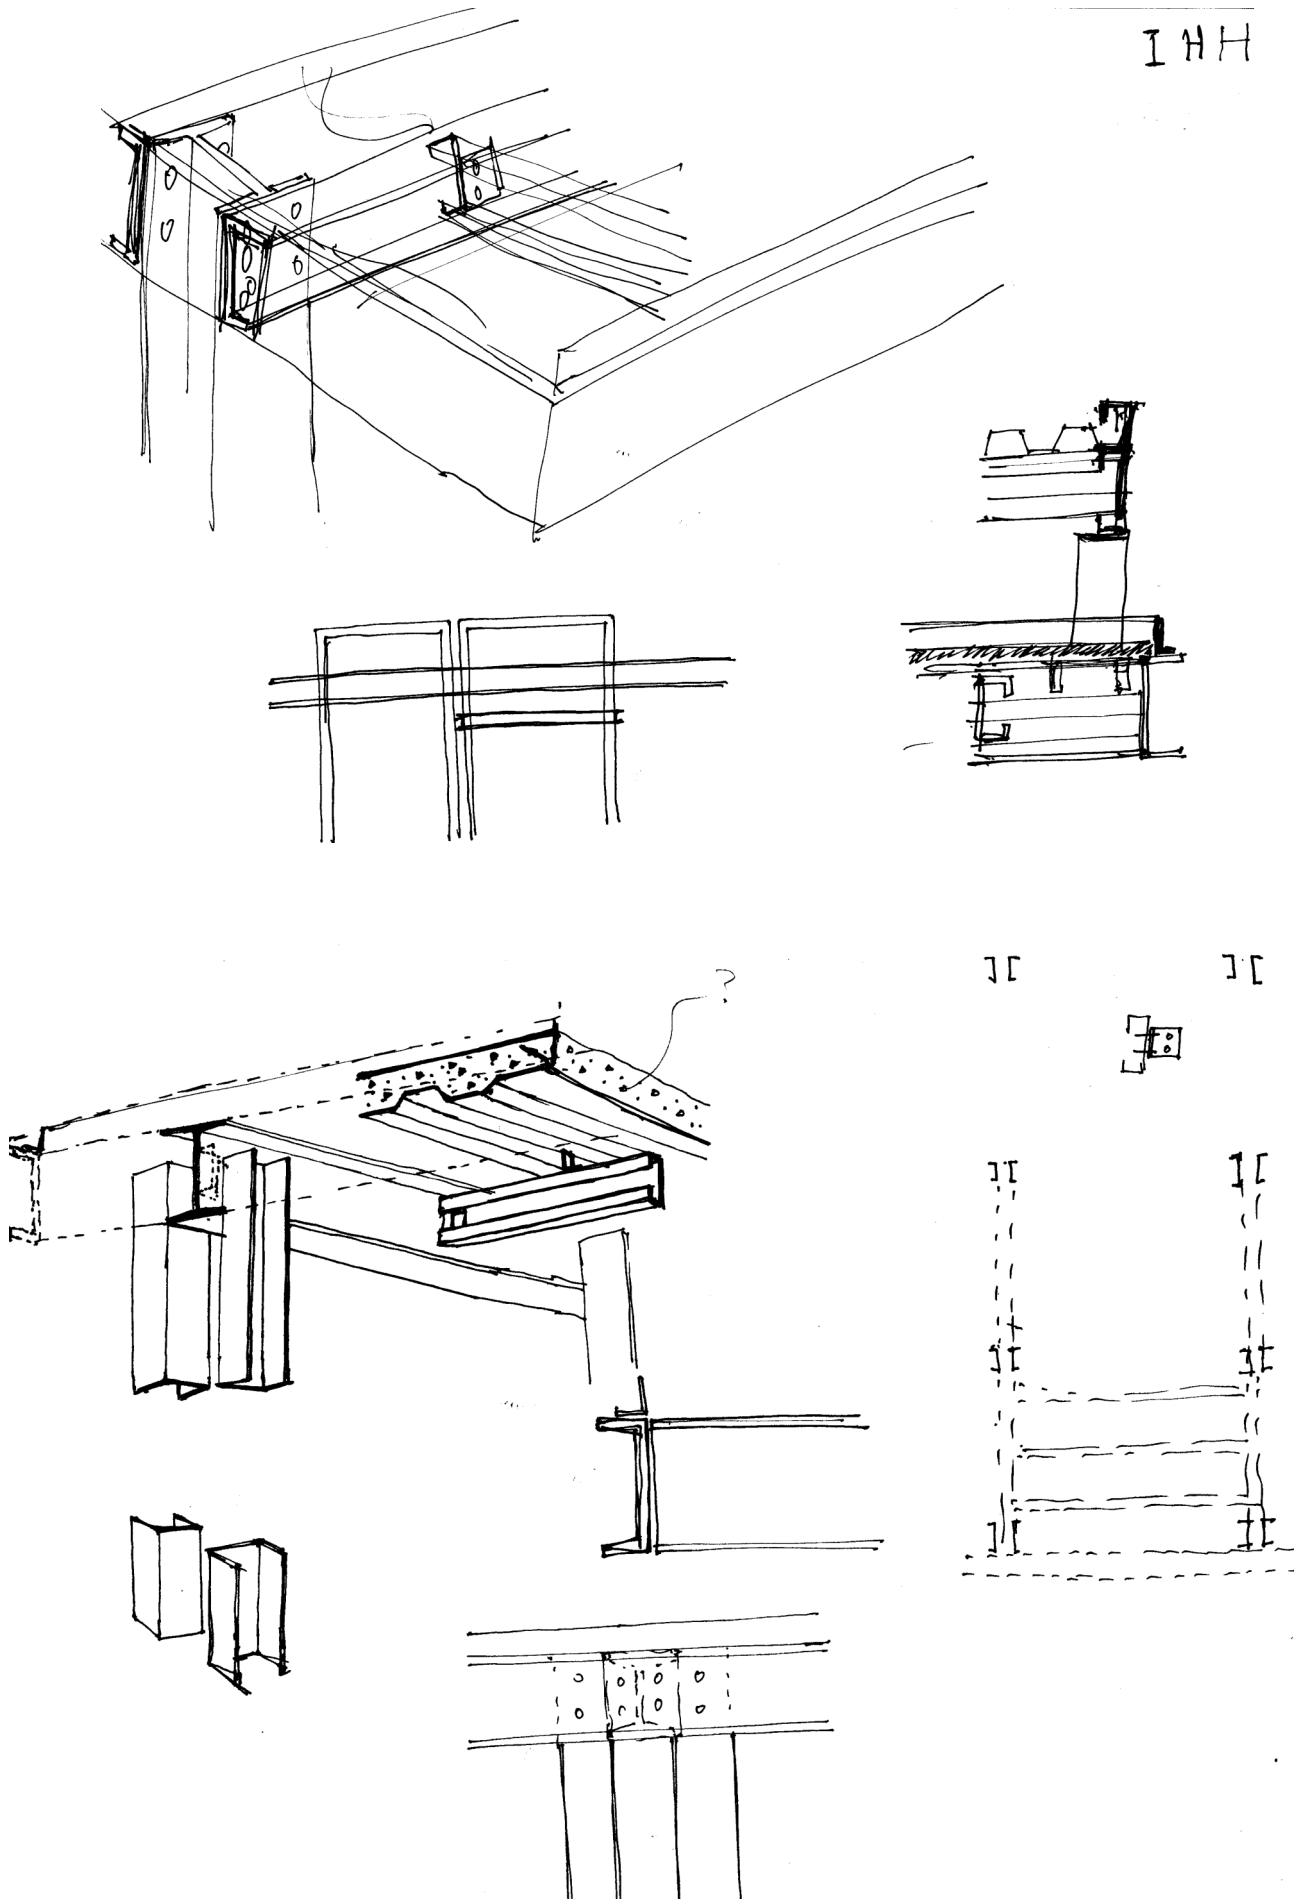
Journal extracts: Assembly and structure of first floor (Author 2020)
